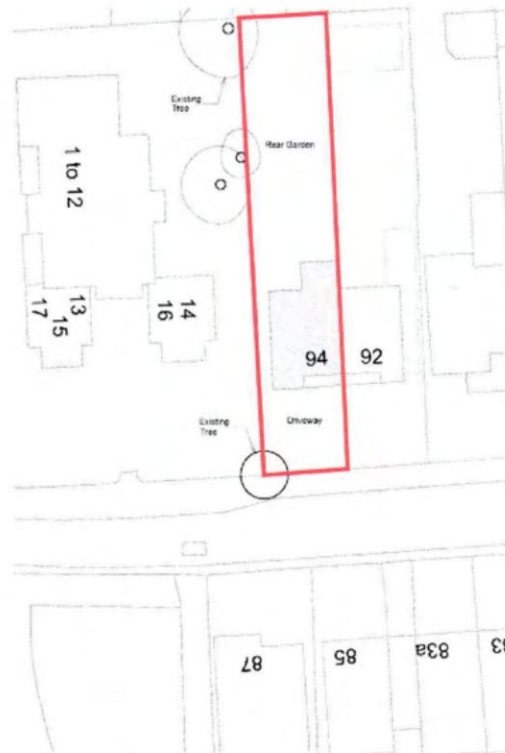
Block Plan for 94 Temple Sheen Road, East Sheen SW14 7RR
